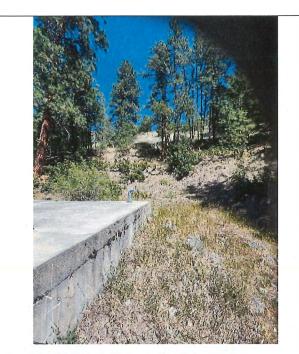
Sunnybrook Reservoir: Top of the concrete walls and roof slab on the left; stormwater channel on the right
